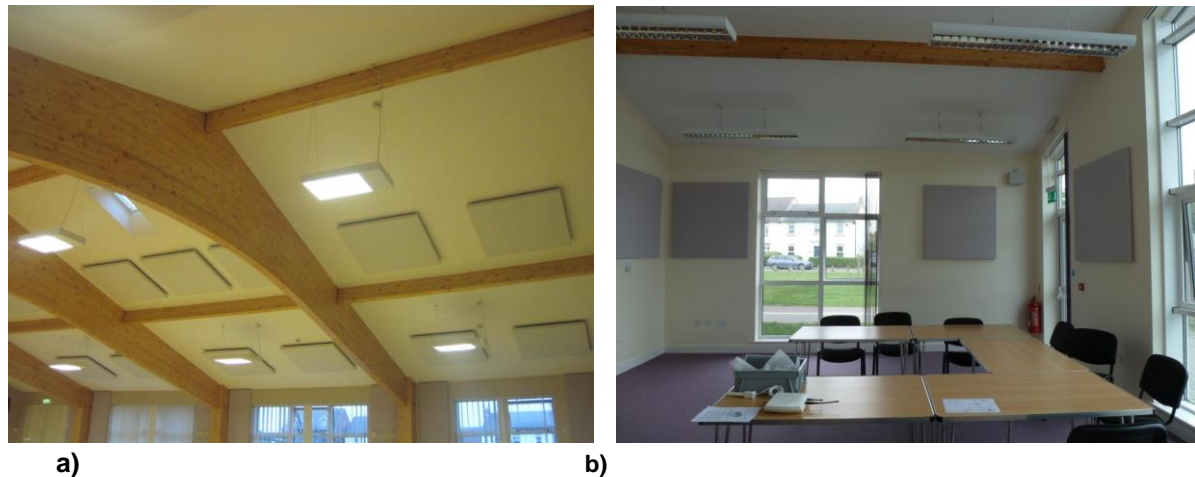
(a) Acoustic panels placed on the ceiling of the main hall. (b) Acoustic panels placed on the walls of the Meeting Room 1.
